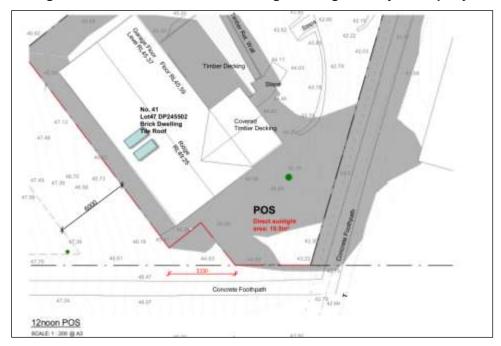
12pm Shadow Diagram of Existing Dwelling & POS
